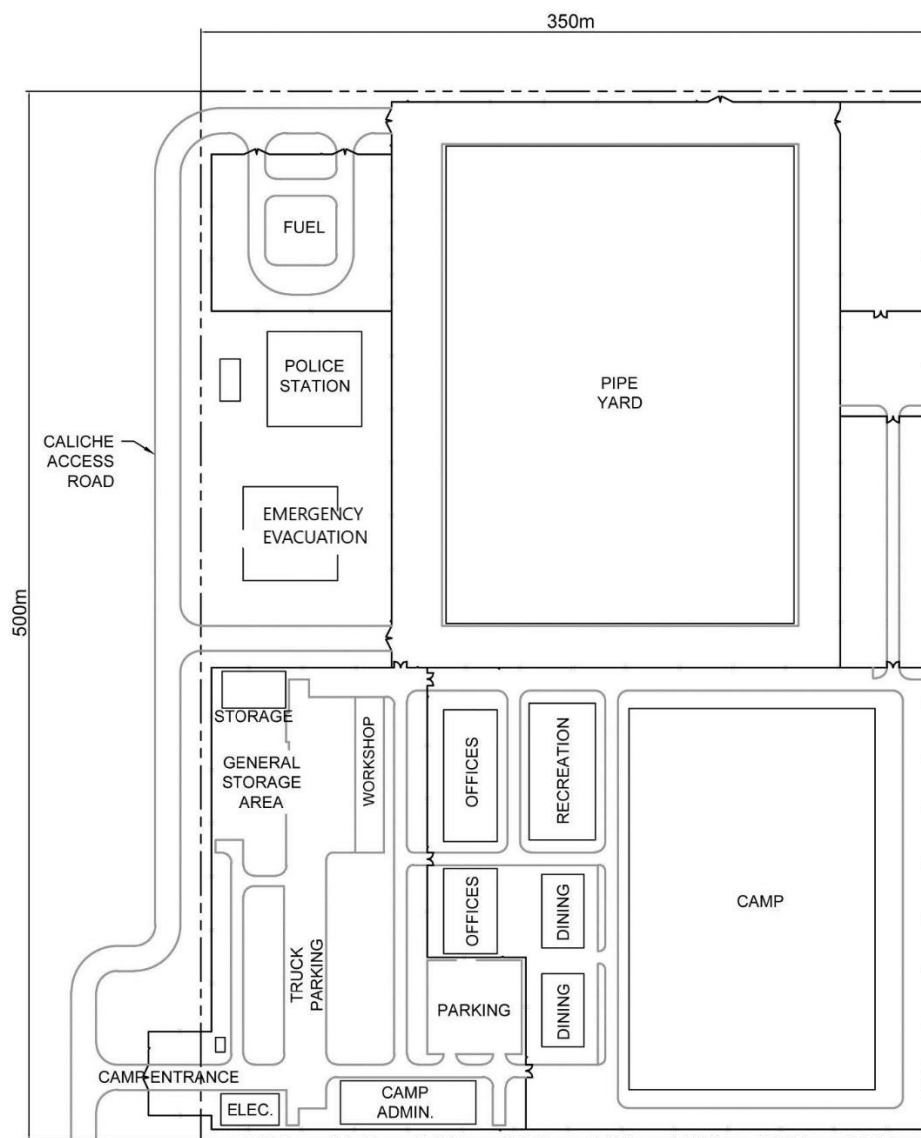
Typical Main Camp & Pipe Yard (MCPY) Layout
